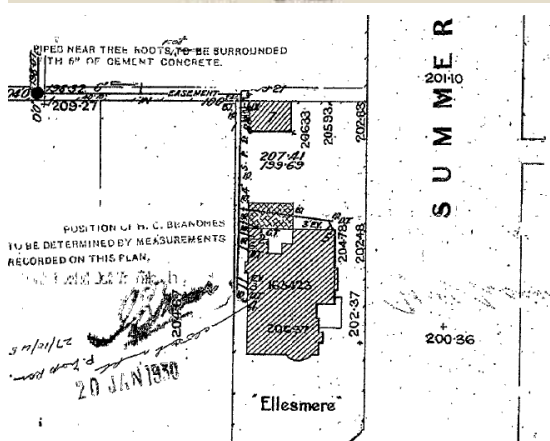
Property sewerage plan, showing the house at 152 Summerhill Road, 1930 (Yarra Valley Water)
